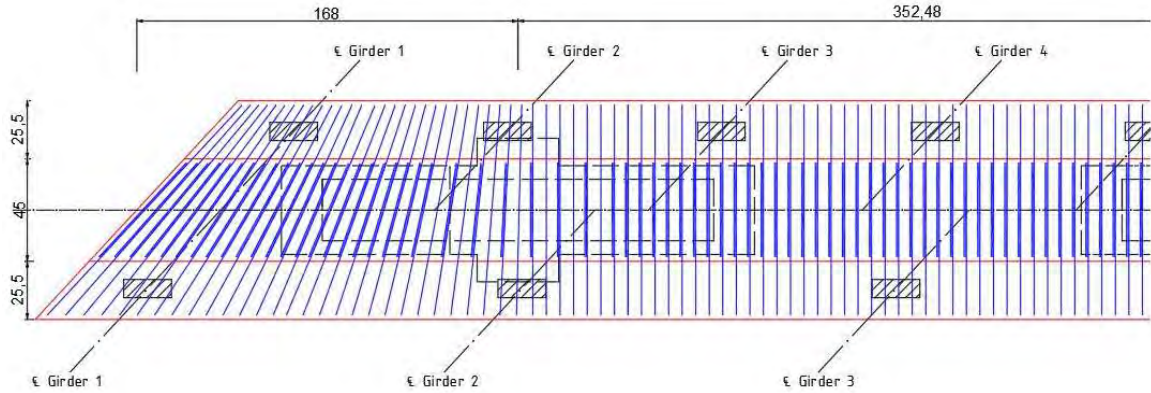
Case 2 for Bent 2 (Traditional Detailing of Reinforcement without End Bars, unit: inch)
